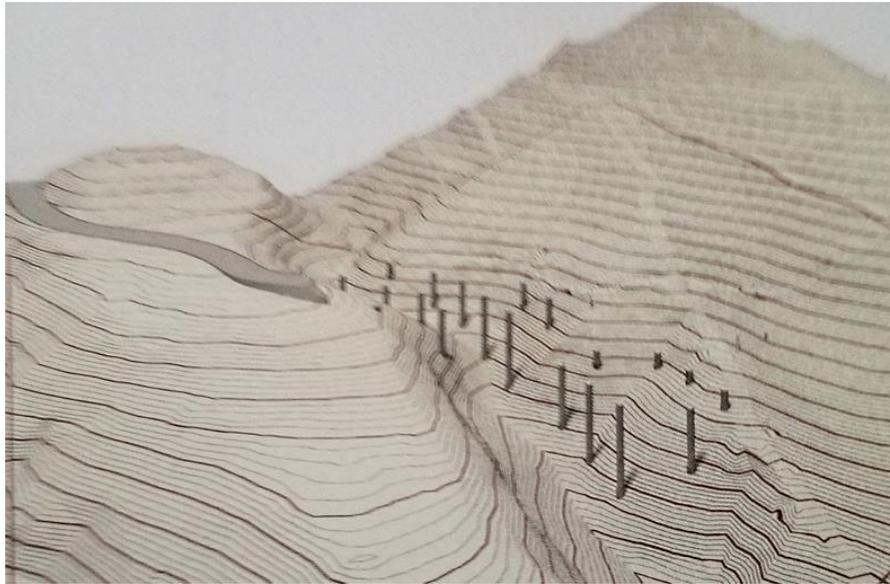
Support columns of poured concrete columns placed on uneven steep topology.
